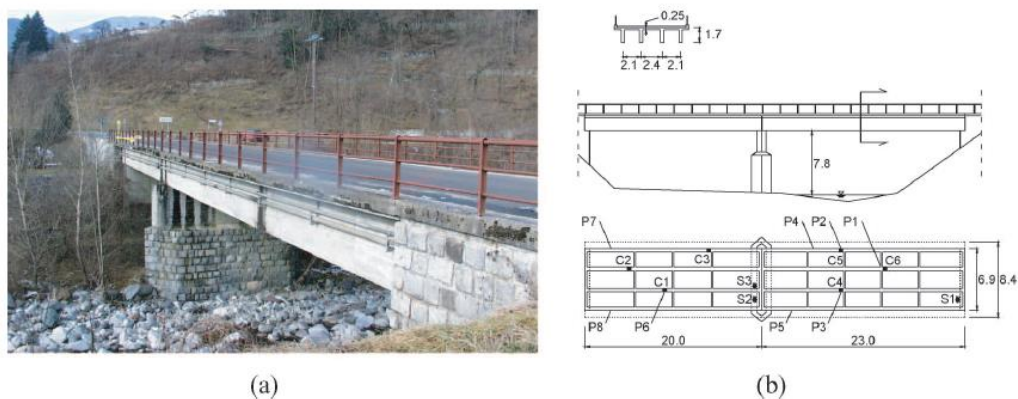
SP65 bridge on Maso River: (a) overview; (b) plan view, elevation and cross section of the deck (Zonta, et al., 2007).
